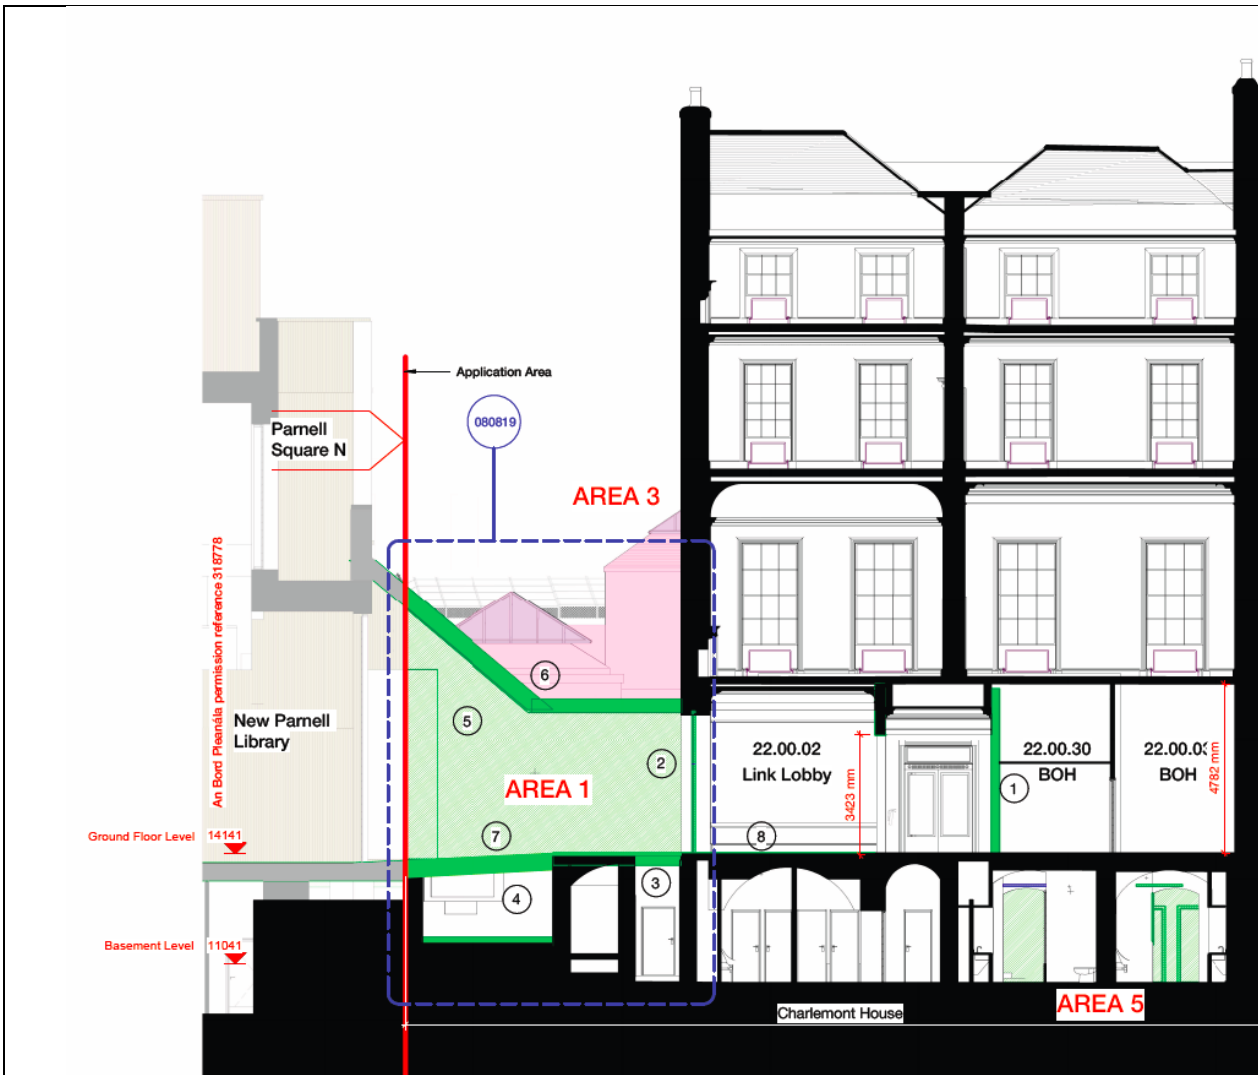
Proposed Section through new link (west-east) with new fabric alterations in green. Not to scale. (Source HB drawing ref: PSL-HBA-HL-ZZ-DR-A-080713 - Rev P05)
